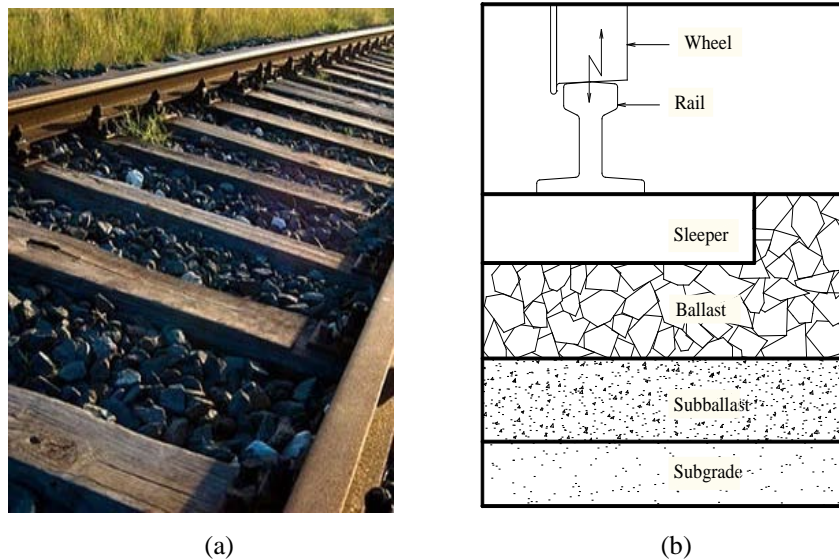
Configuration of rail track system: (a) Photograph of ballast railway structure, (b) Profile of railway structure
